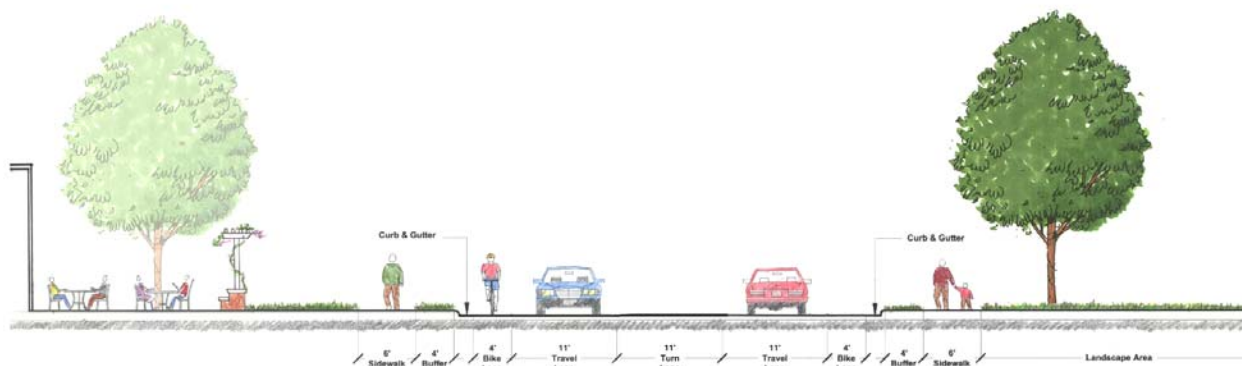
Proposed Improvements for Yanceyville Street at the Farmers Market – Cross-Section
